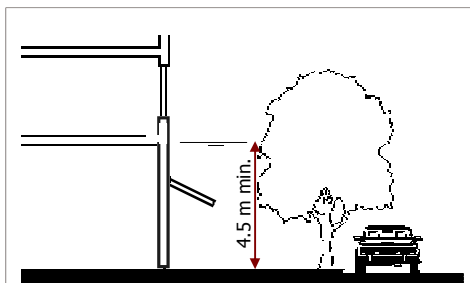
The ground floor of retail and commercial uses will have a minimum height of 4.5 m.
